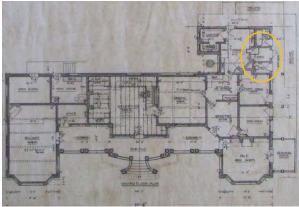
Location of the original coal storage area and staff bathroom which have undergone alteration to form the current shower facility in current Space 1.12 as shown (circled) on the original ground-floor plan.
